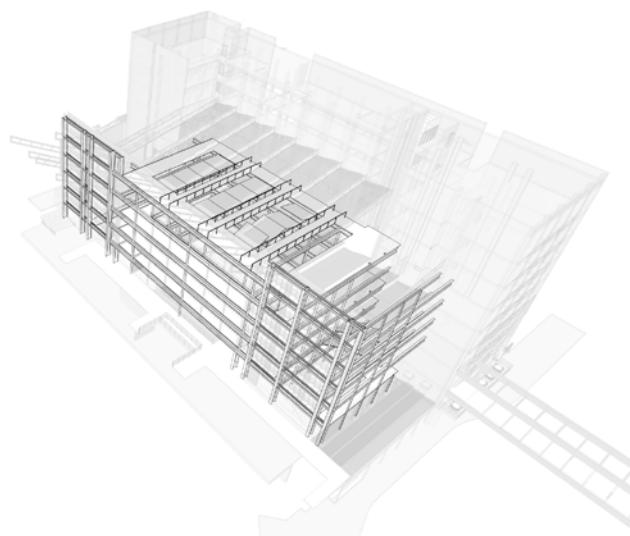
Overhead acoustic panels suspended from steel trusses.
